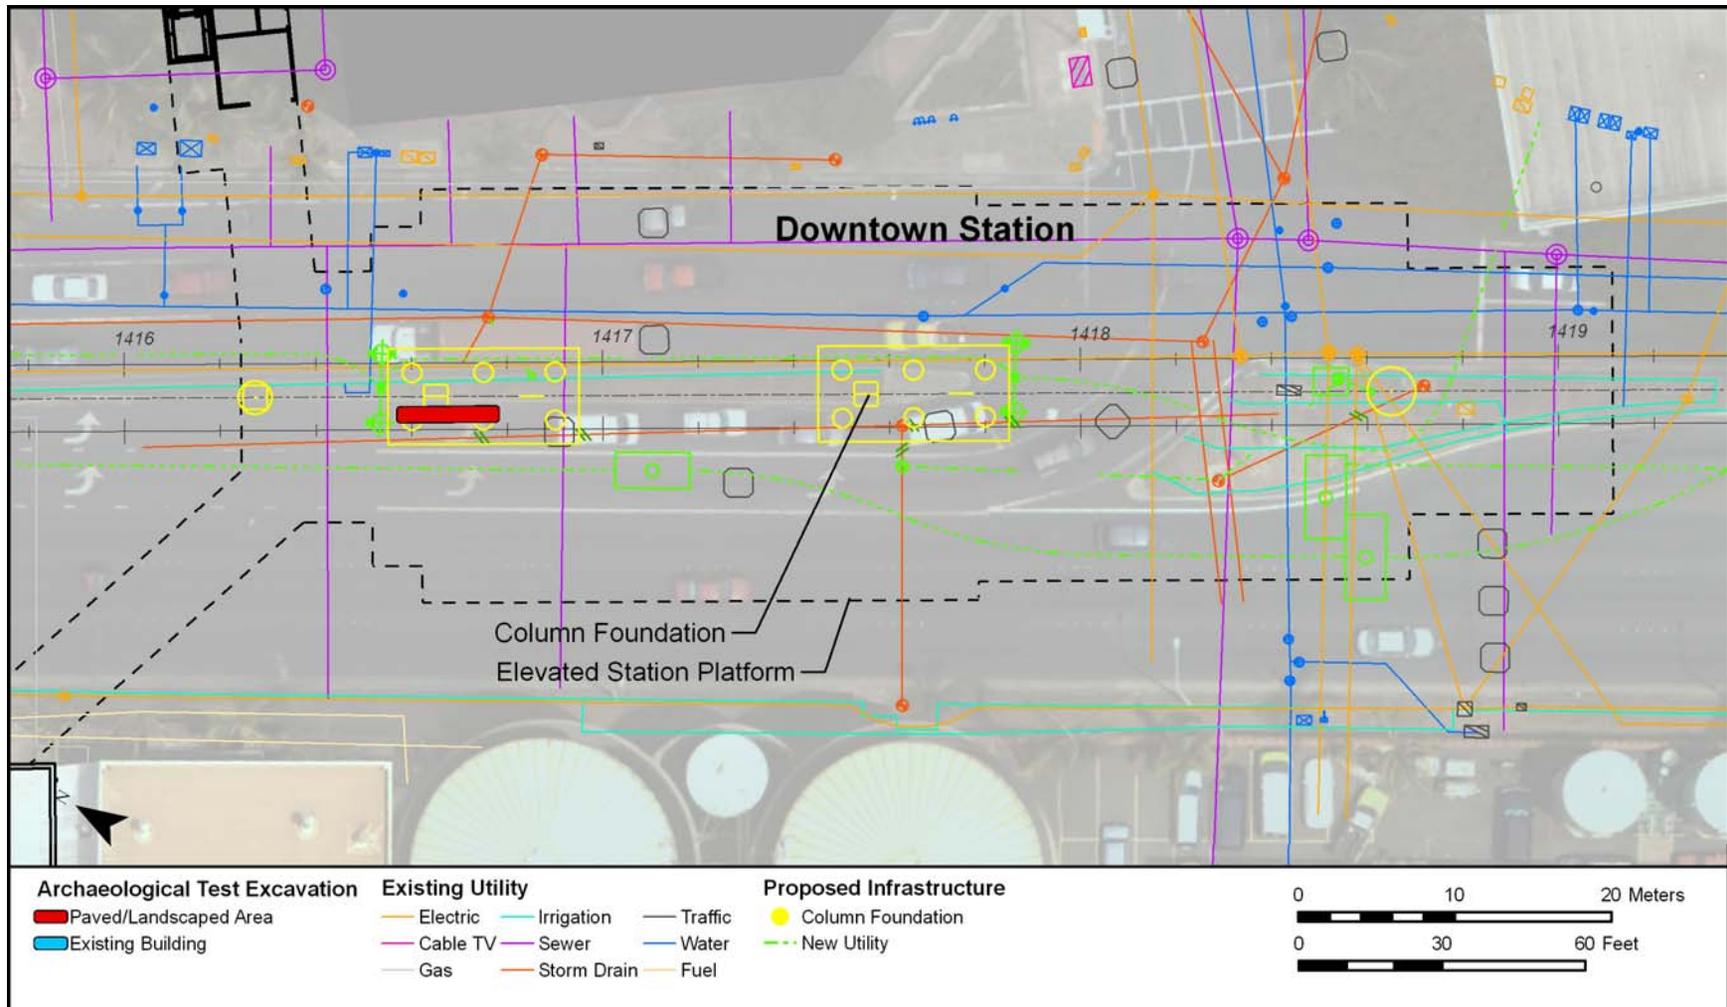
Downtown Station, detail of column foundation layout at Nimitz Highway (no testing at 14 station column foundations due to their location seaward of the former shoreline and constraints)
